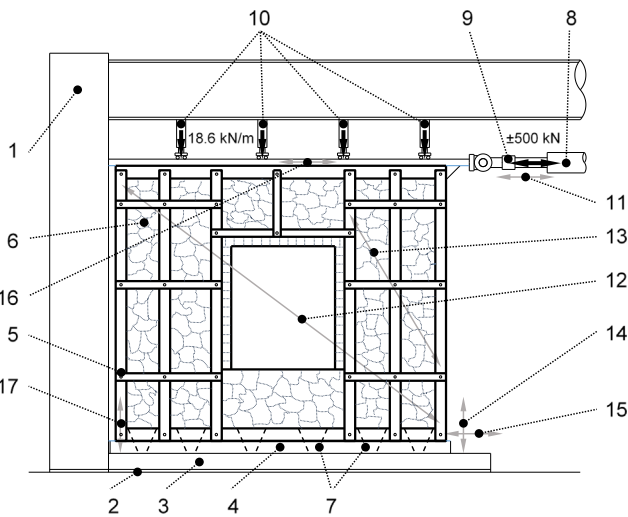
Experimental setup: mechanical testing machine (1), floor (2), metal frame (3), cross-laminated timber foundation (4), wooden frame (5), masonry in-fill (6), metal fasteners (7), piston-type hydraulic cylinder (8), load cell (9), hydraulic jacks (10), displacement transducers (11–17).
